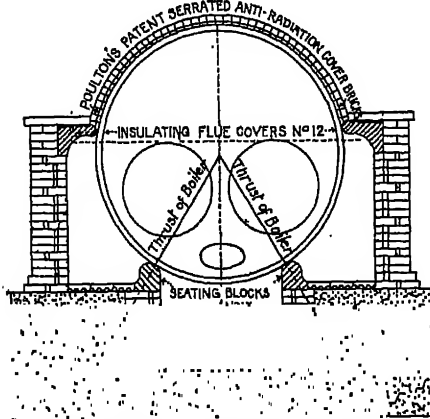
Cross-section of Setting for Lancashire Boiler
